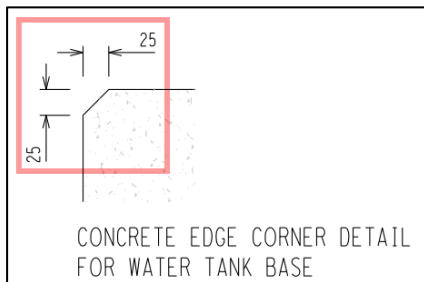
Excerpt showing the chamfered concrete slabs corner/edge typical detail of the water storage tank slab
